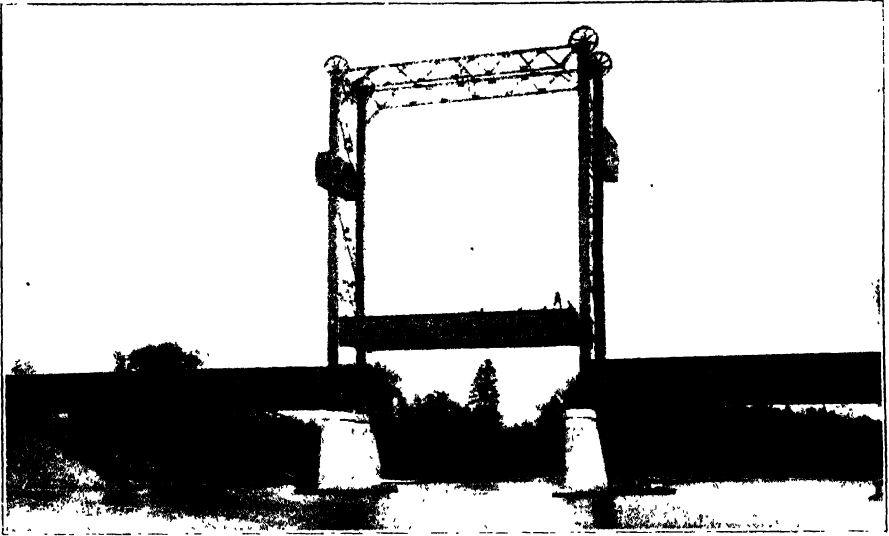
b. St. John and Quebec Railway Bridge over the Oromocto River in New Brunswick.
